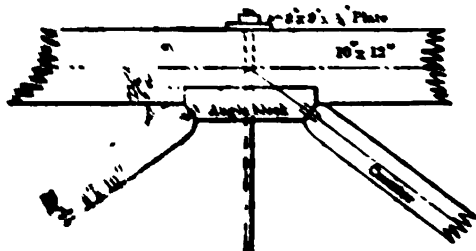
Alternate Detail of Joint 2, Fig. 3
